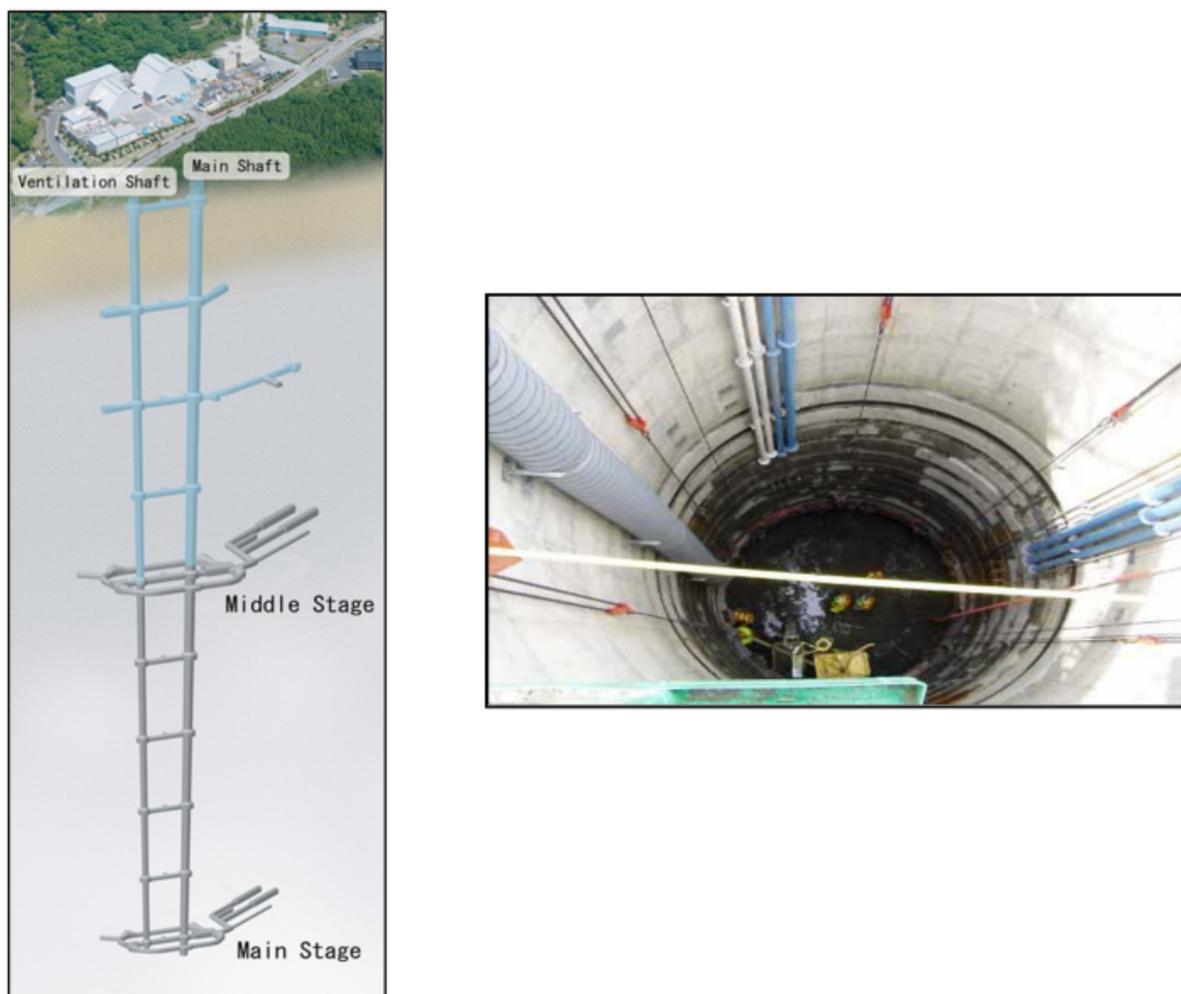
Layout of the Mizunami Underground Research Laboratory in Japan (left), and photo of tunnel shaft construction (right).
